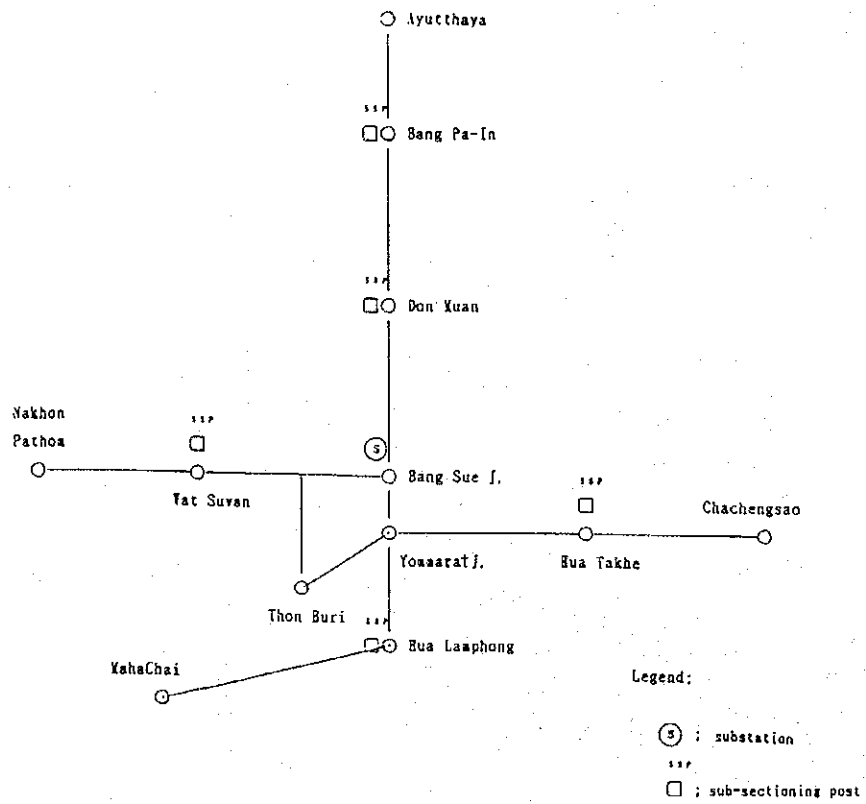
Layout of Substation and Sub-sectioning Posts
